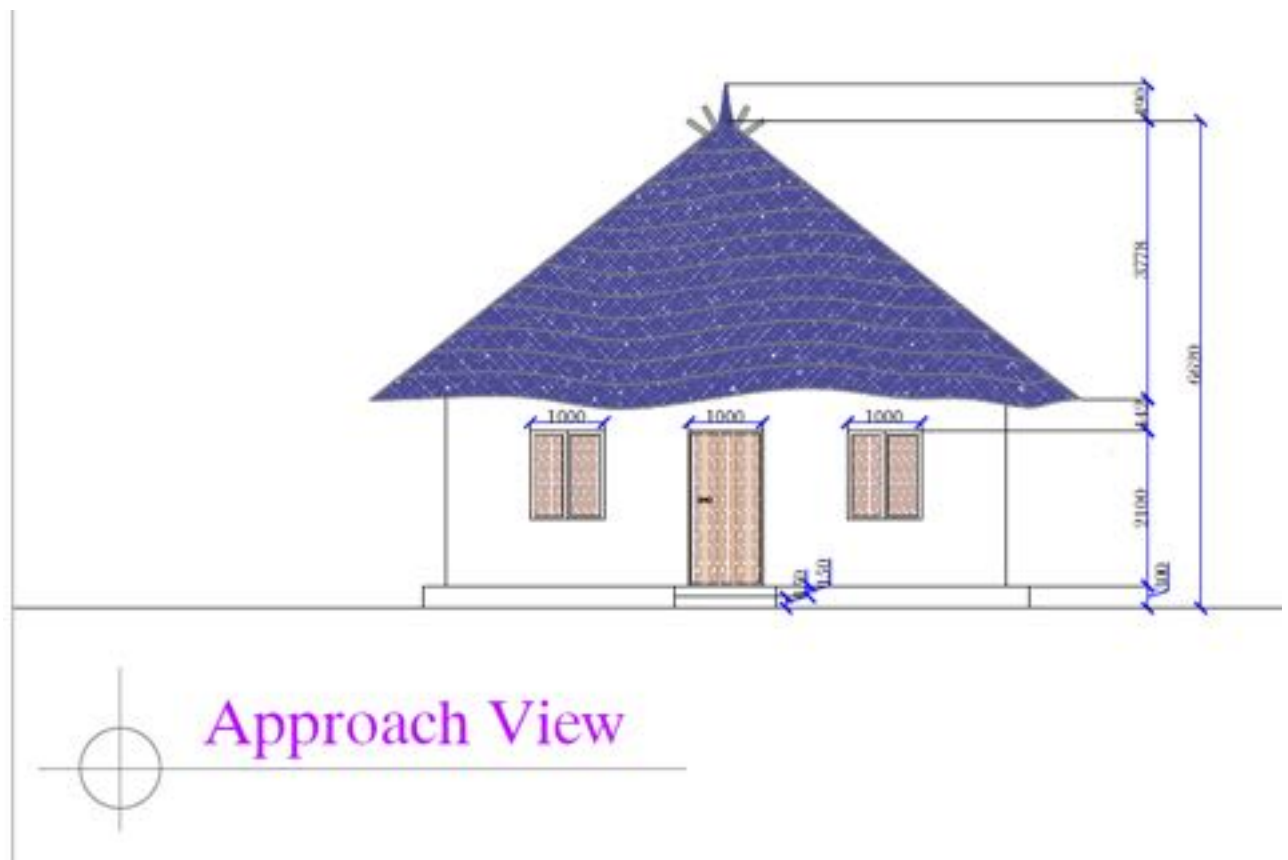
Approach View of building plan (prototype, with measurements in mm).
